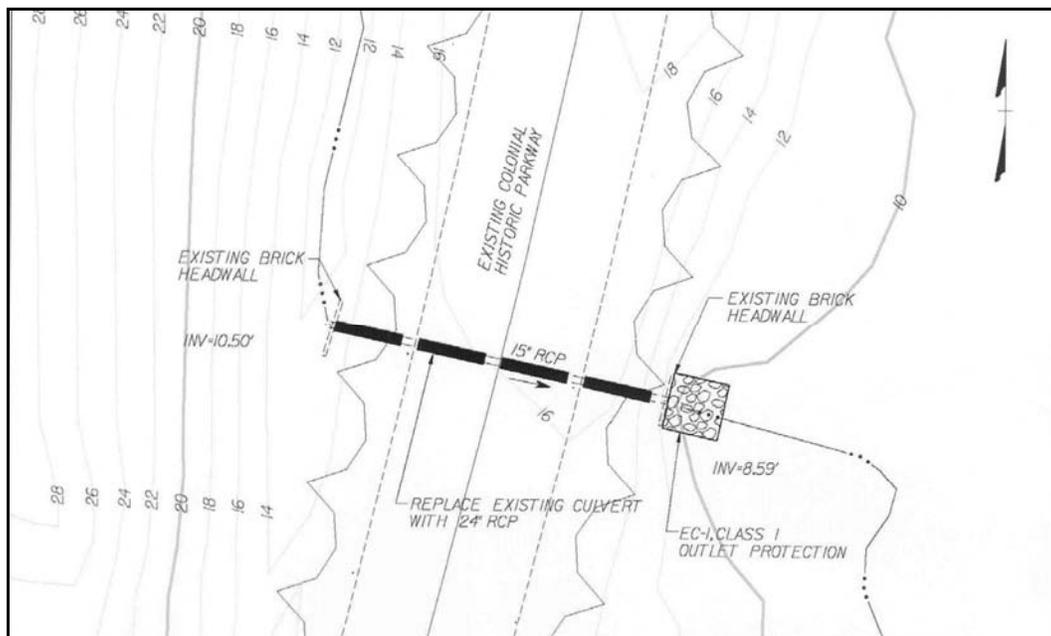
Concept Plan of Alternative 2 at Site C (Replace Existing Culvert with 24-inch RCP); Source: NPS, 2005
